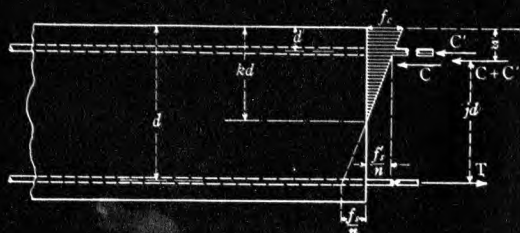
Nomenclature for Concrete Beam Reinforced for Tension and Compression.
